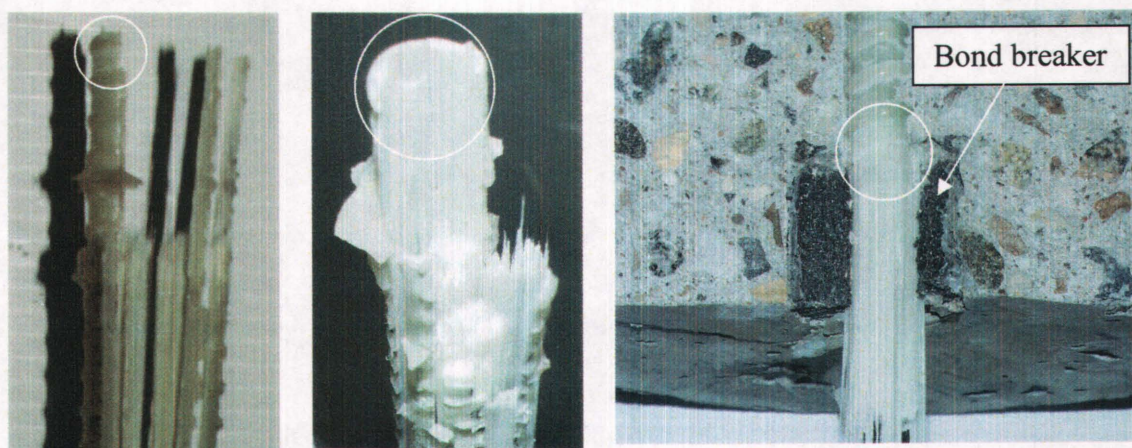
Photos of Specimen C-bar 25-75% Water #2 showing break of outer layer and longitudinal cracking. Inside circles illustrate starting point of breakage at interface of bonded and unbonded portions of the bar.
